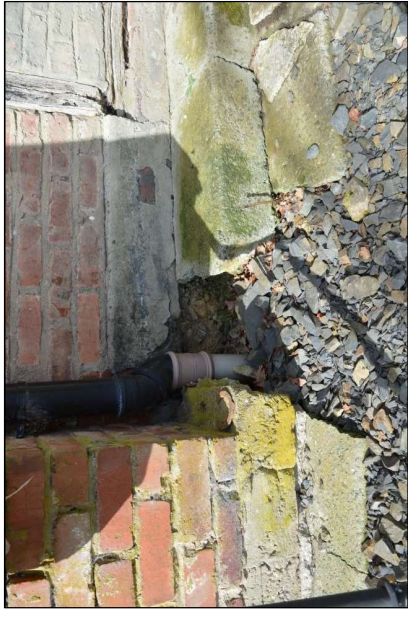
Foundations at the south end of the surviving timber frame (CPAT 4900-0021)
